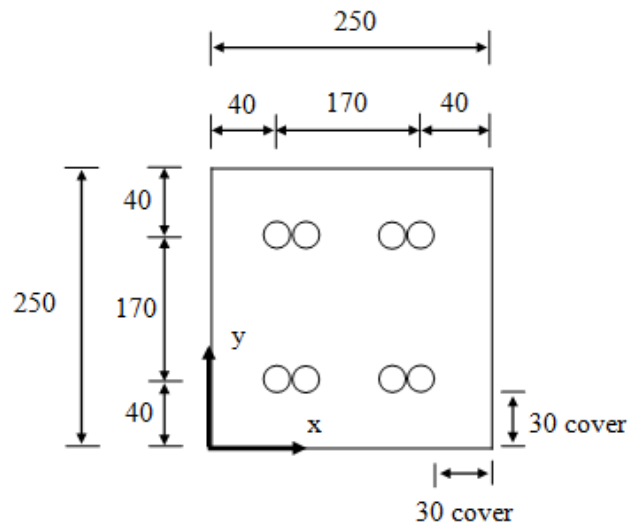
Connection with straight lapped reinforcement cross-section view at  $z = 1000$  mm
